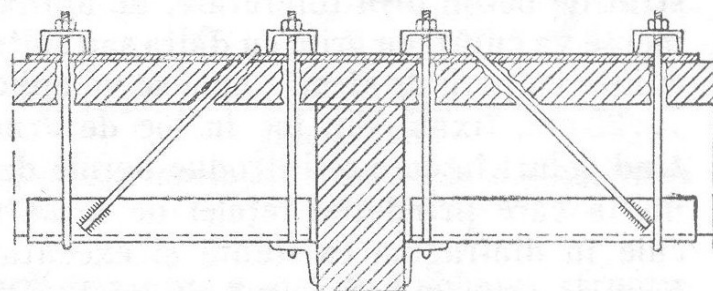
Local strengthening of beams at shear forces with steel profiles
